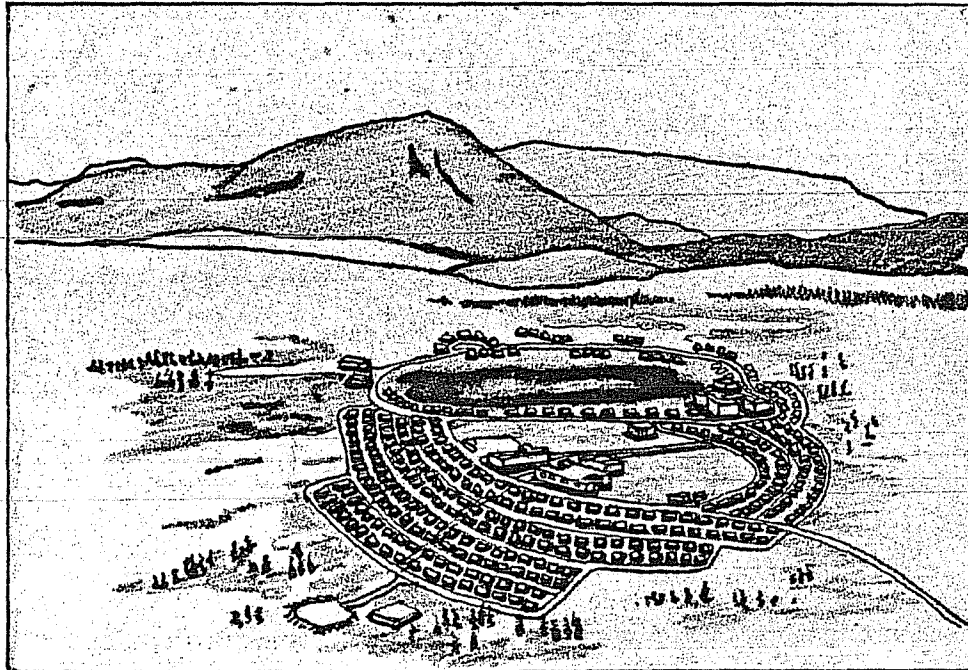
SITE OF PERMANENT TOWNSITE/CONSTRUCTION VILLAGE (LOOKING NORTH)
